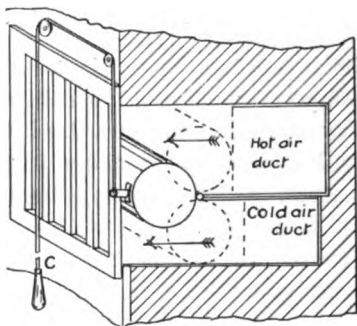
Cylinder Mixing Damper for Air Inlet.
